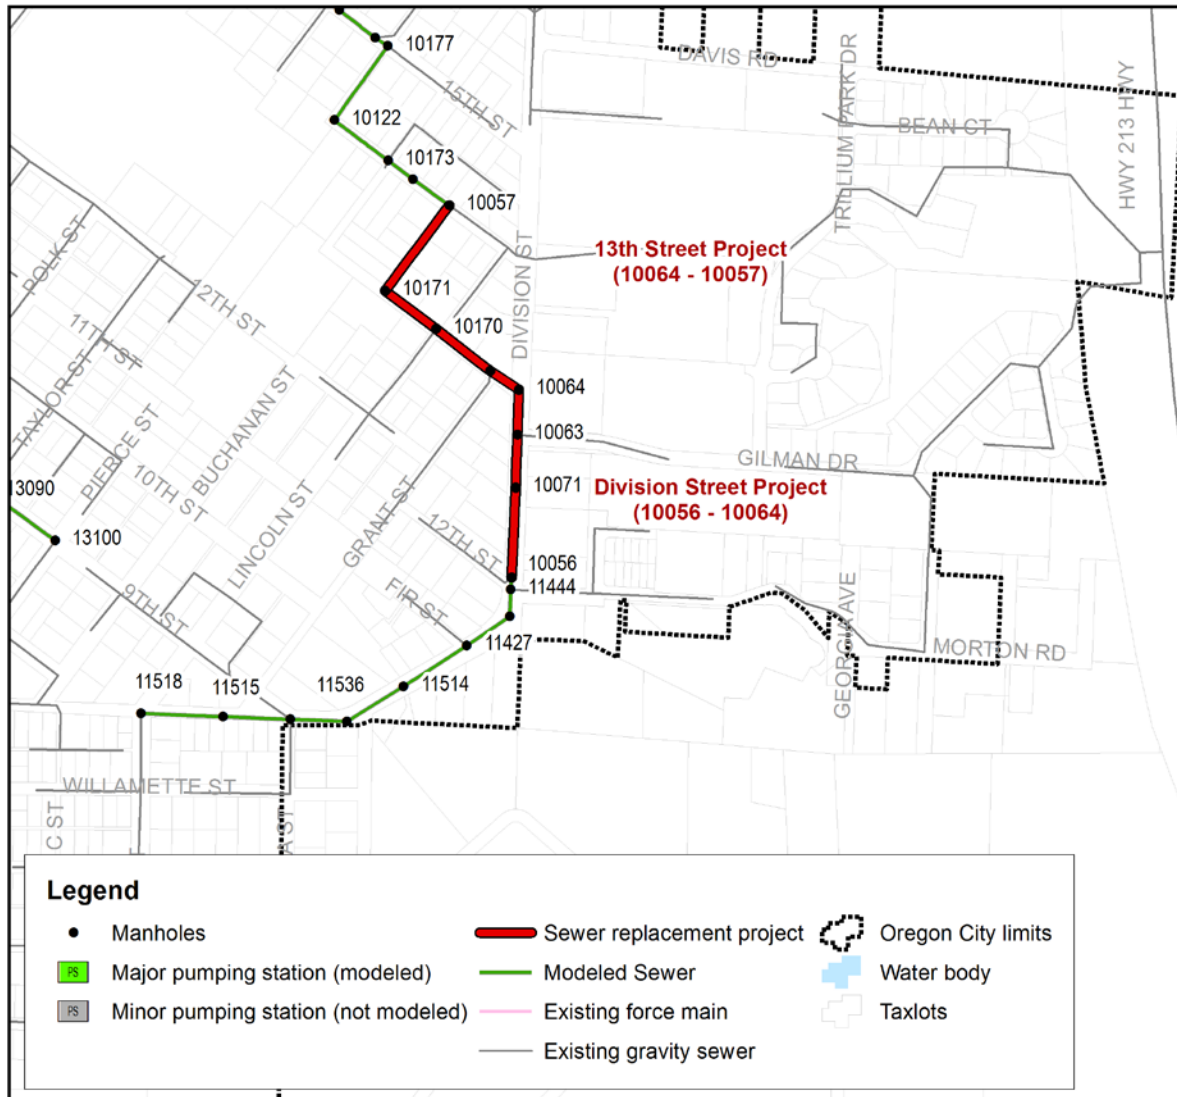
Required 13th Street and Division Street sewer upgrades, 1- in 5-year storm event
